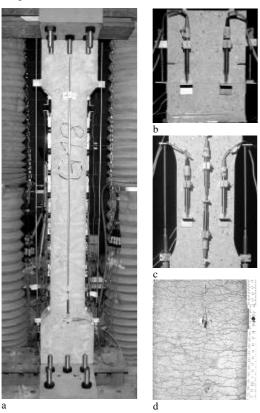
Material test on unnotched and notched specimens, reinforced tension member and crack pattern
